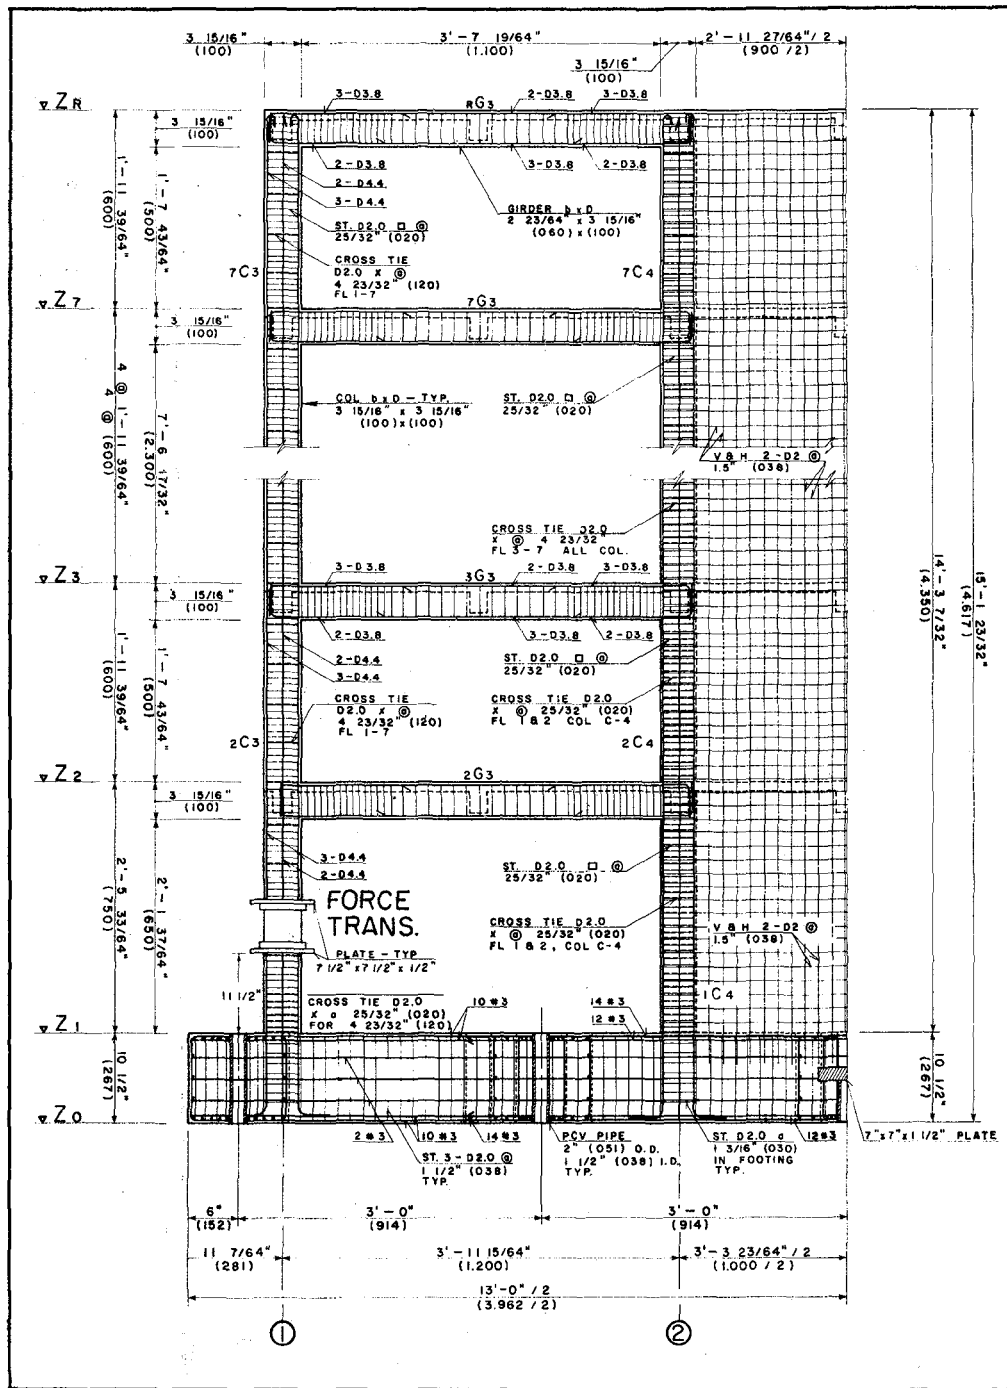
(a) TYPICAL DETAILING OF INTERIOR WALL-FRAME B OF 1/5th-SCALE MODEL
